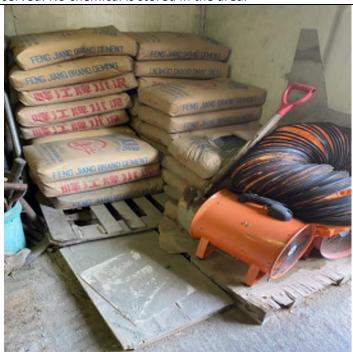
Lot No. GLA-TPP 776 - Existing DSD's and Contractor's Site Office (Store Room) — The tools and cement are placed on wood panel, and the floor is paved with concrete . No oil stain/ floor leakage is observed. No chemical is stored in the area.
